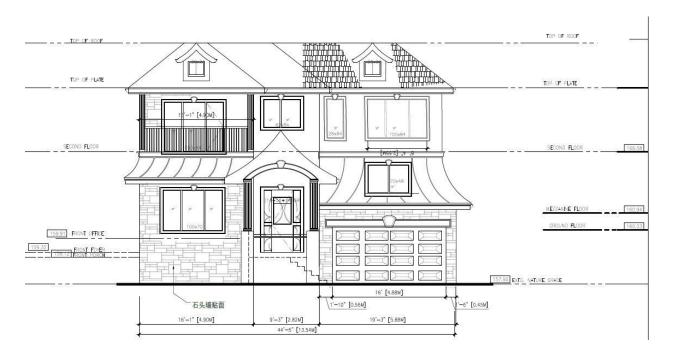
The front or west façade as proposed for 347 Queen Street South. (Drawing by client, Jan. 2021.)
